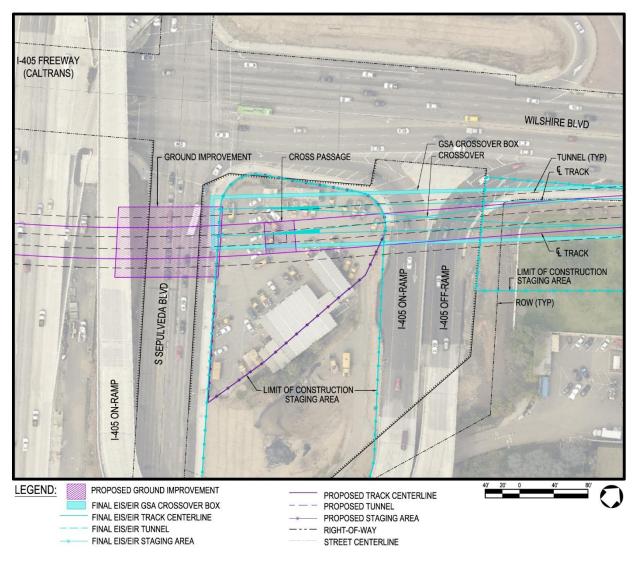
Ground Improvement Grouting at Sepulveda Boulevard
